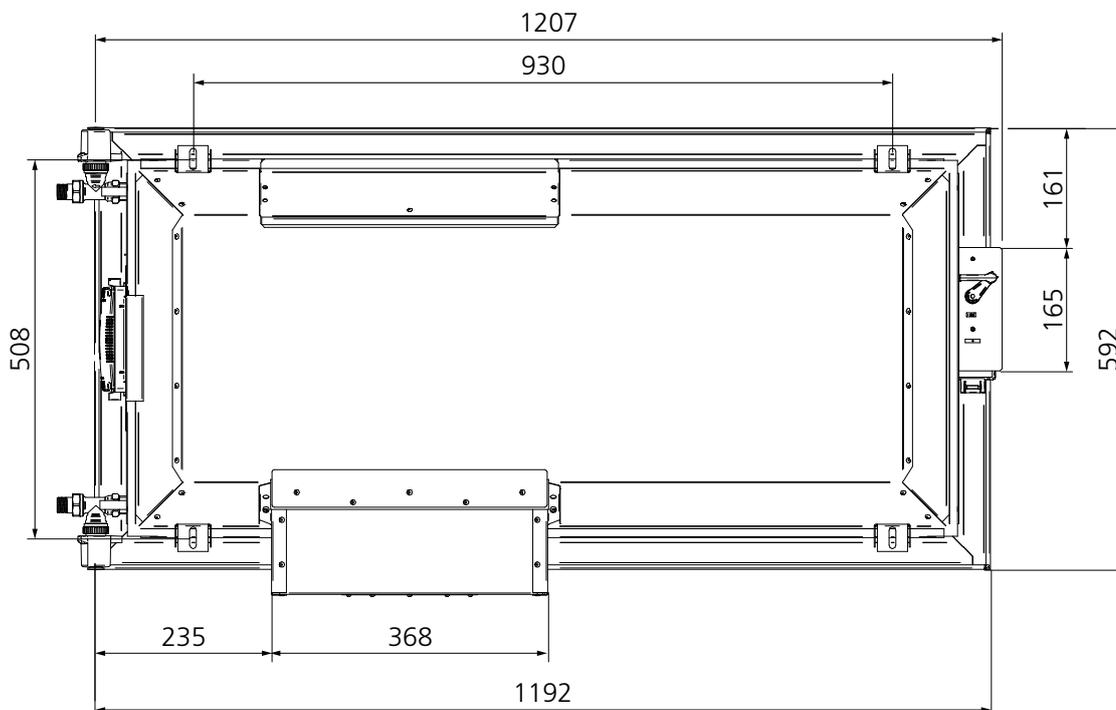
Dimensional drawing, view from above. Air connection on the long side - pos 2.
